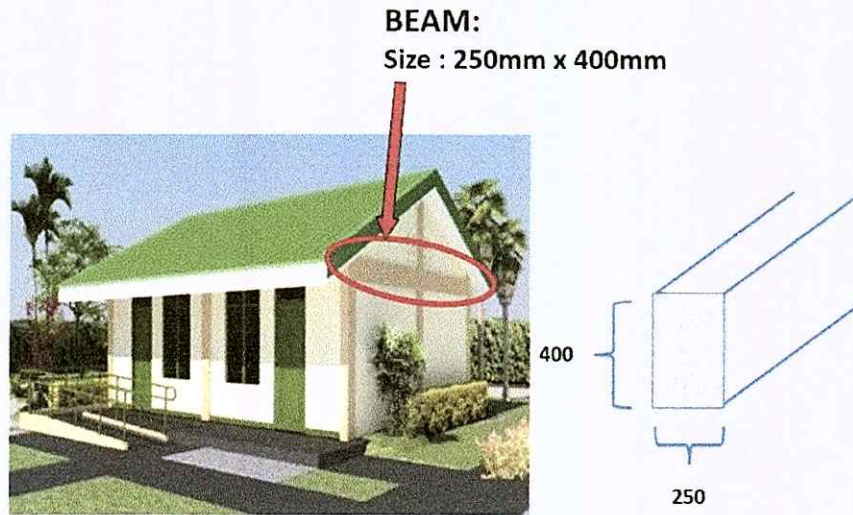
Beam Structural Design for Disaster-Resilient School Buildings
